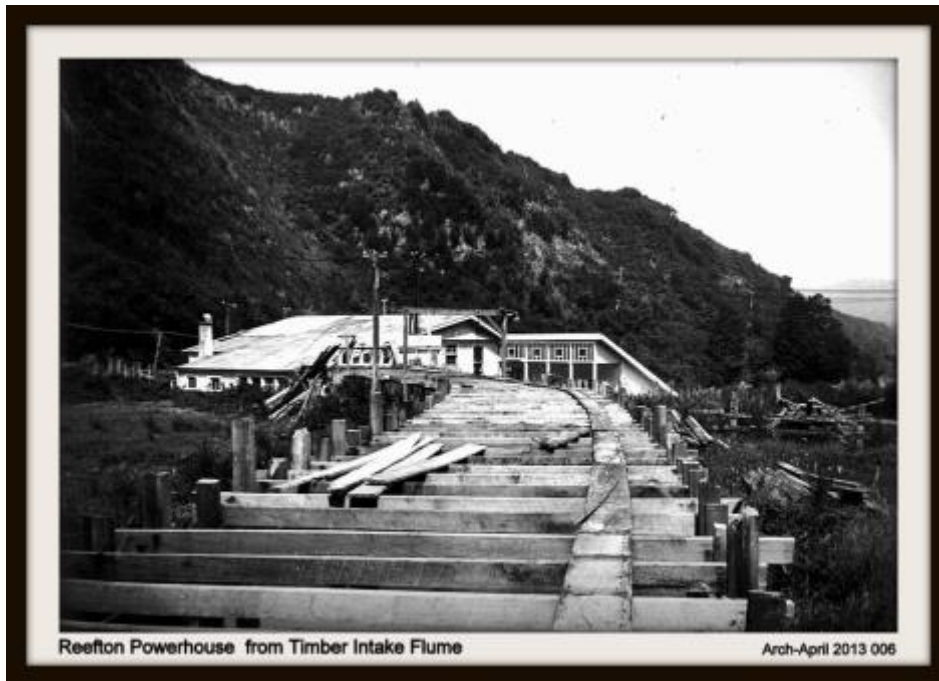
The timber water race, looking towards the 1938 power house, and showing a timber walkway on top of the race.
